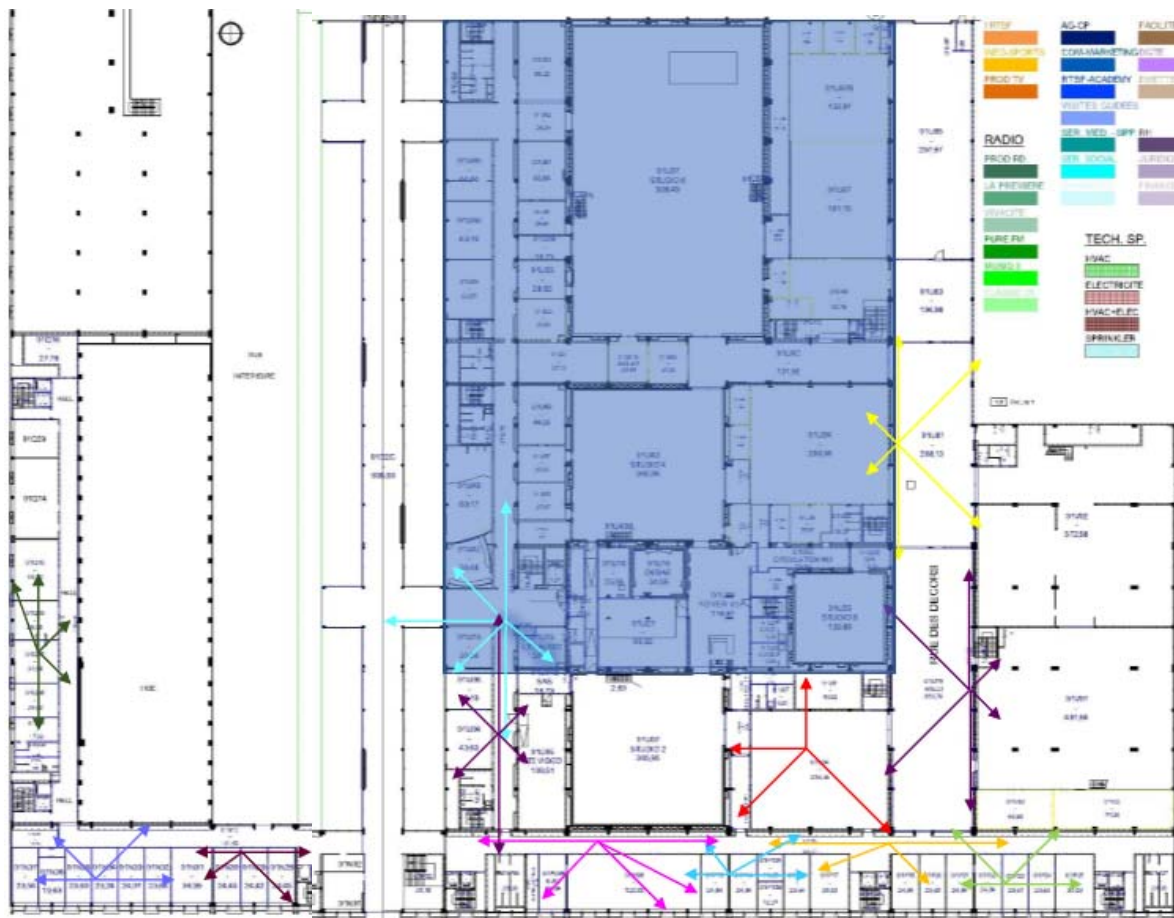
Design at 5 GHz for Floor 1 in Building CHJM
